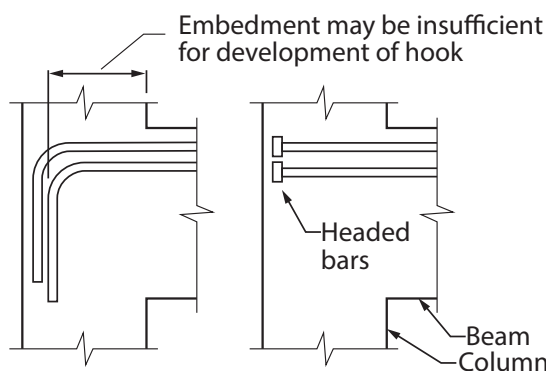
Headed reinforcement can help avoid congestion and ensure adequate embedment to develop bars. (Detail source: STRUCTURE Magazine, May 2011, “Tips for Designing Constructible Concrete Structures, Part 2.” Image courtesy of Headed Reinforcement Corp.)
